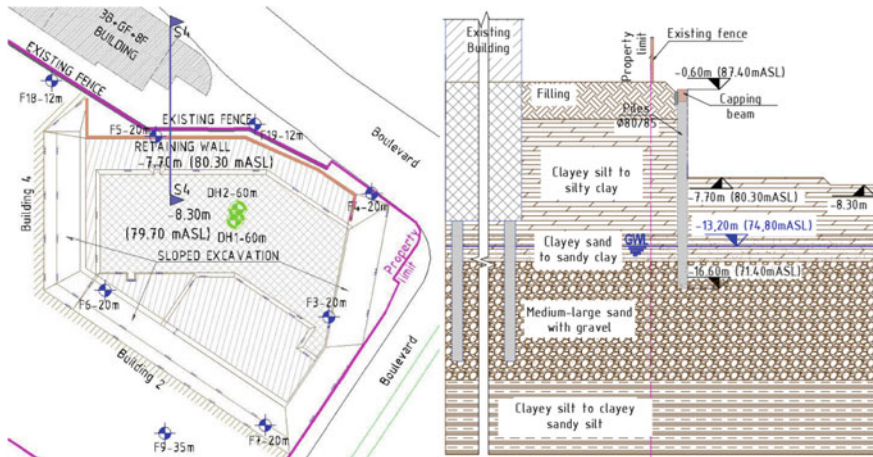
Excavation and retaining system for Building 1: layout, including adjacent constructions and site investigations (left) and characteristic section, including adjacent constructions and lithology (right)
